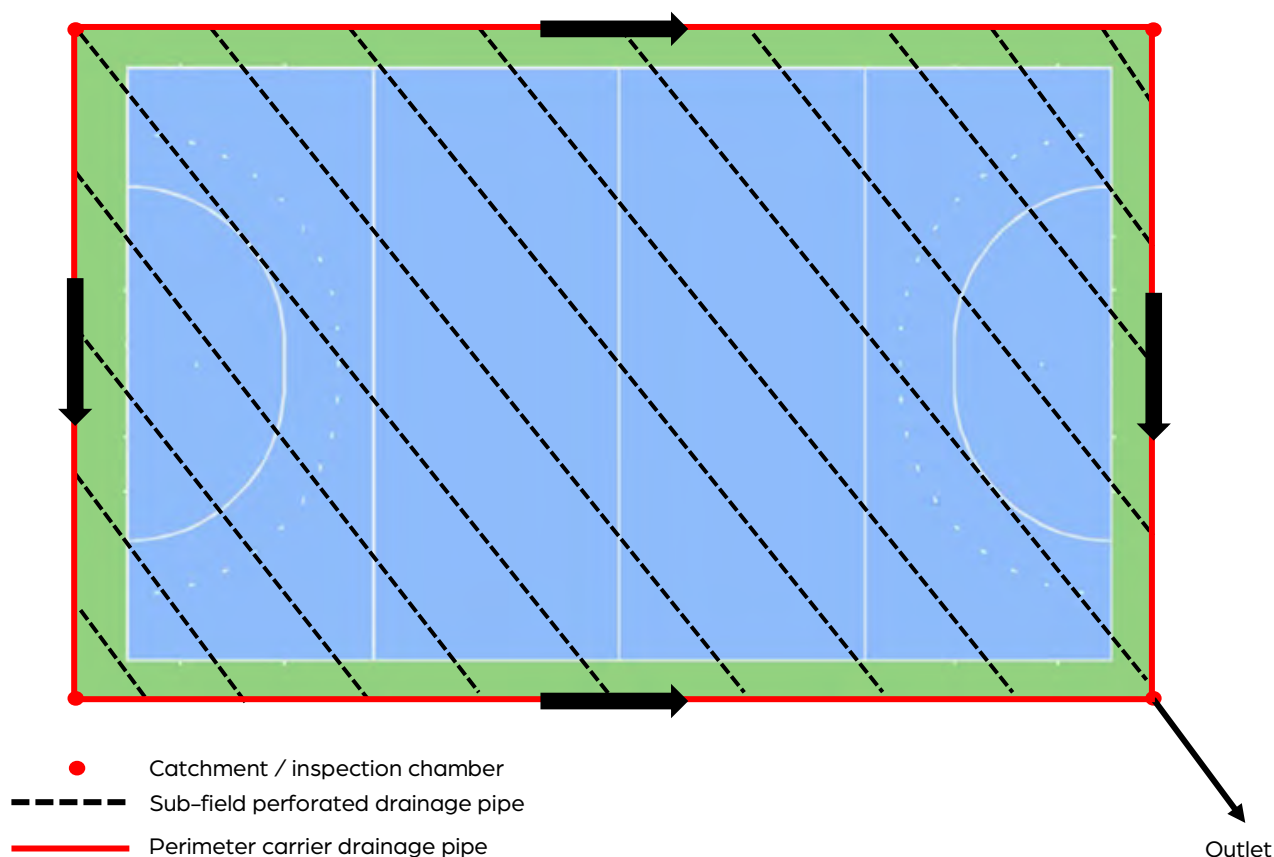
typical sub-field drainage system used with vertically draining field constructions. Other drainage trench configurations are also used.
